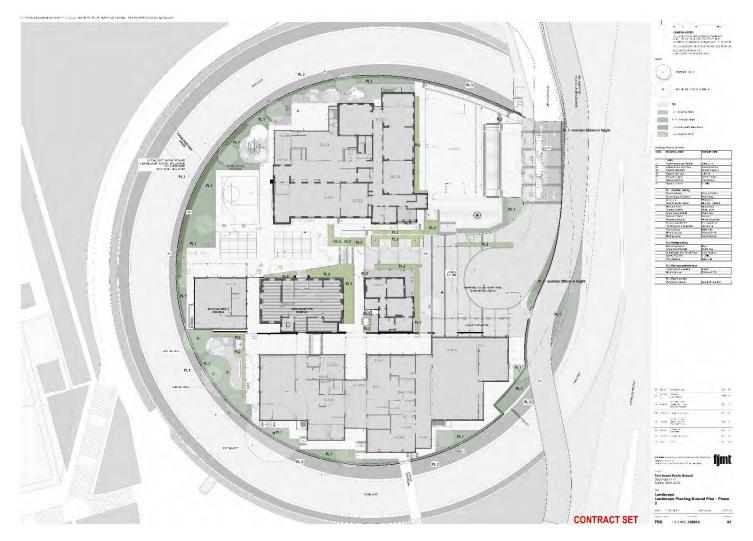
Landscape Planting Ground Plan. (Source: Lendlease, 2021)
